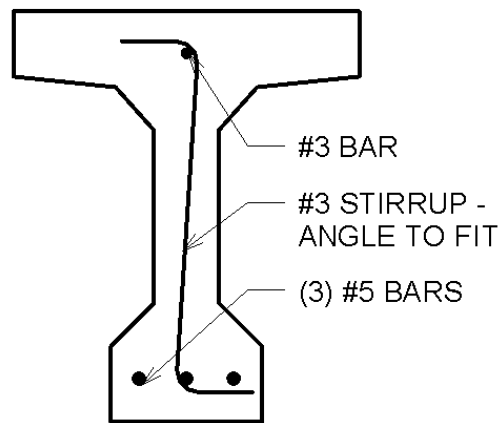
Cross-section of Specimen 1 Steel Reinforcement
